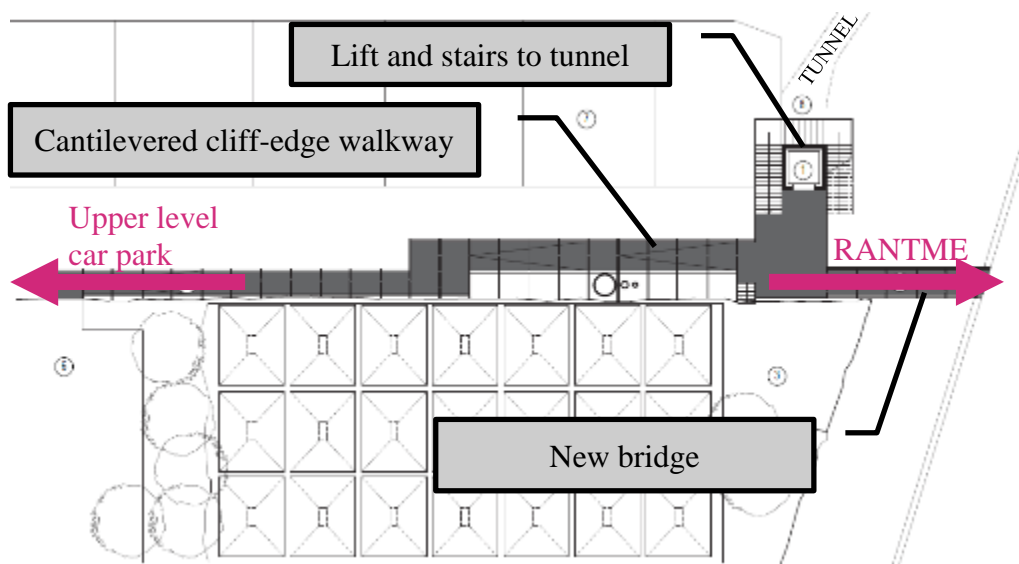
Proposed lift and stairs to tunnel, connecting the bridge link
